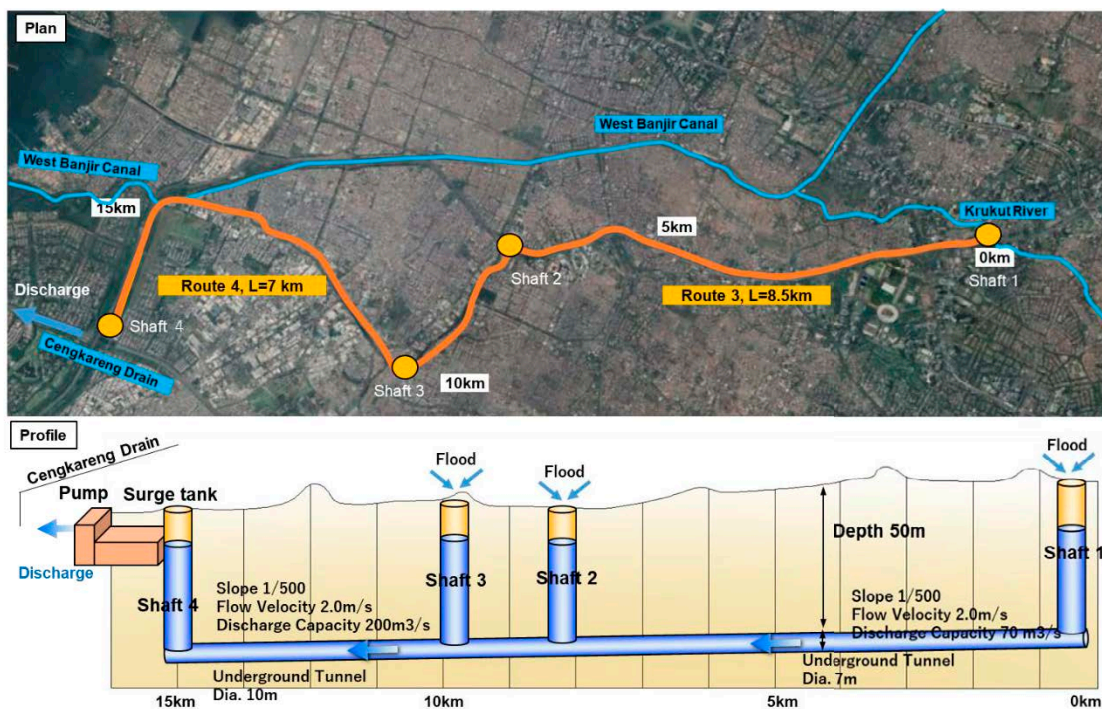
Schematic Plan and Longitudinal Section of the Underground Channel Route (4) + (3)
